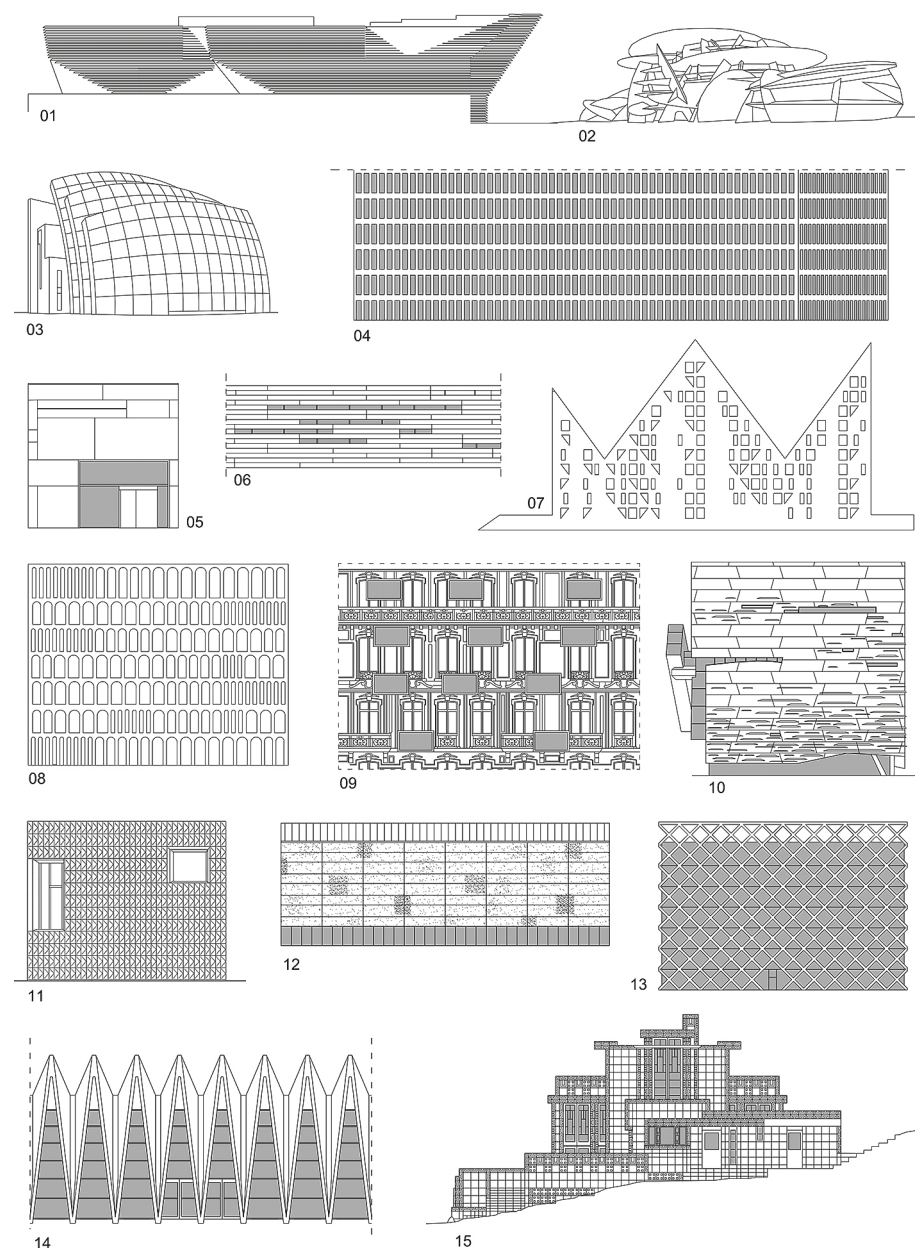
Discussed buildings with facades made of precast concrete elements (by authors)
